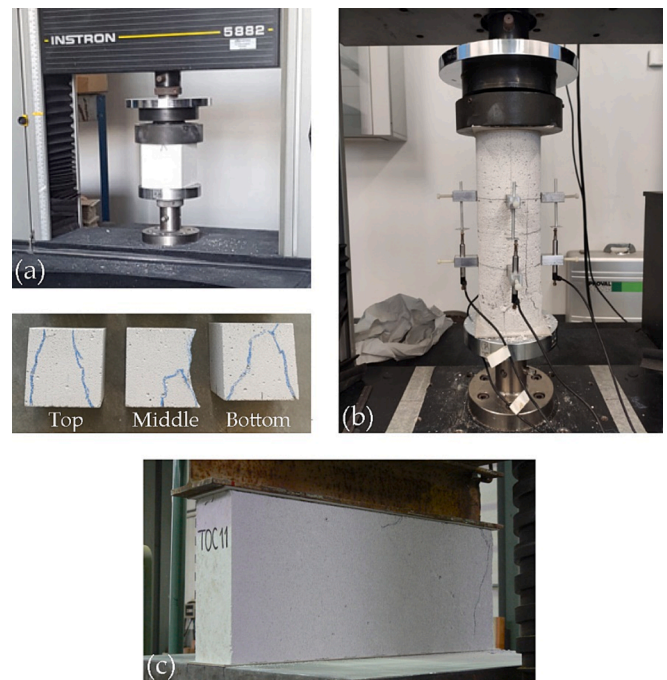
Compression tests on (a) cubic specimens, (b) cylindrical specimens, and (c) blocks, with the corresponding crack patterns at failure.
